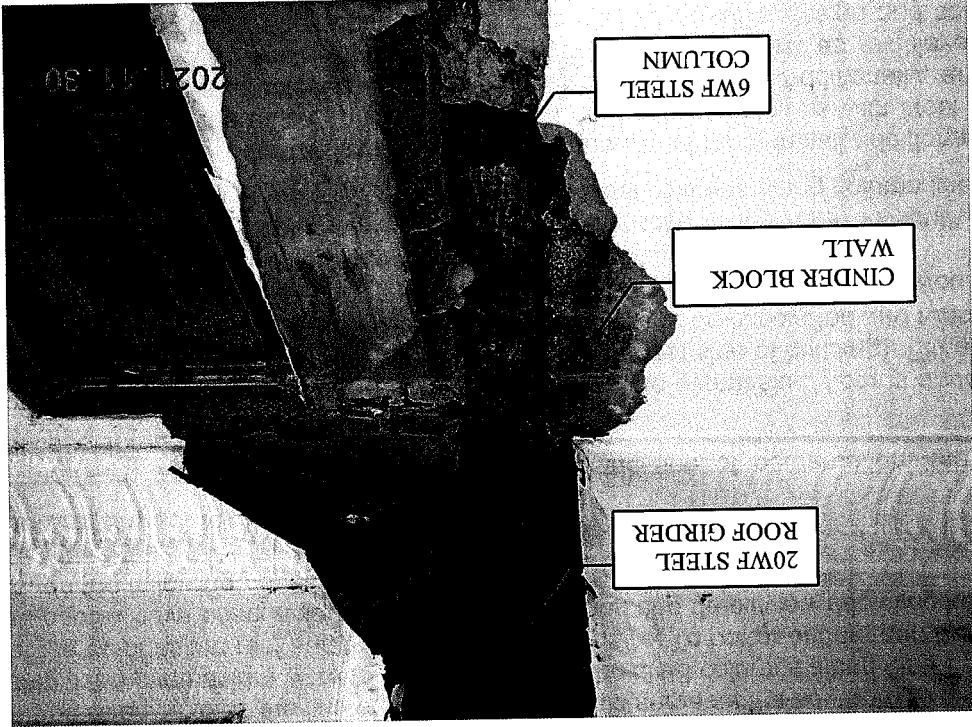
Connection of 20WF steel roof girder to 6WF steel column - Grid F/2
